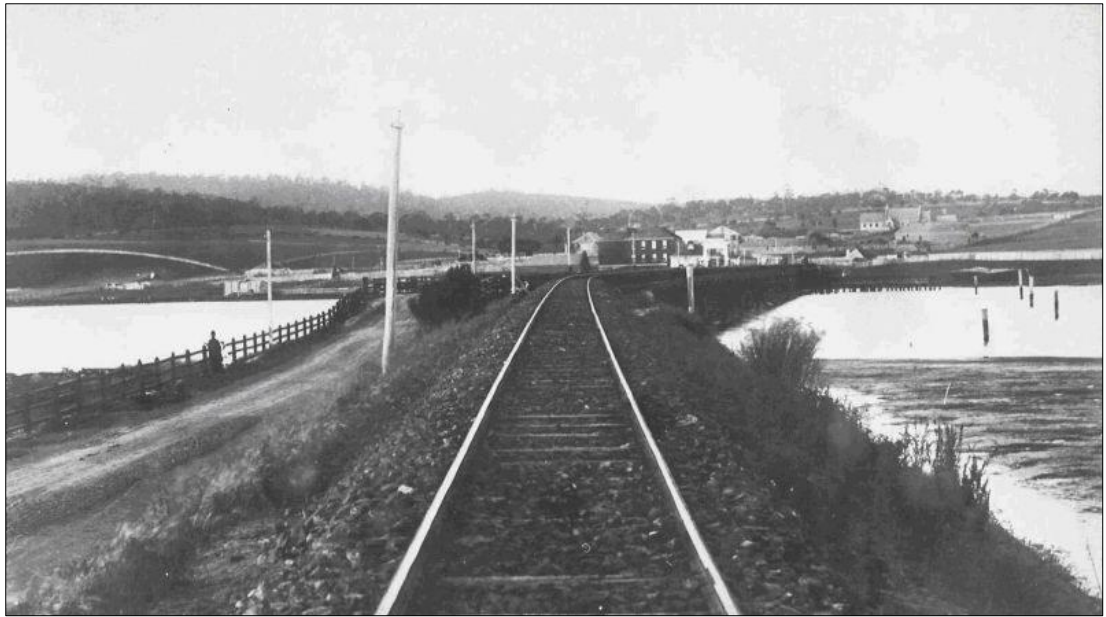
Causeway view looking north along the 1874 rail bridge c1870 [TAHO]
